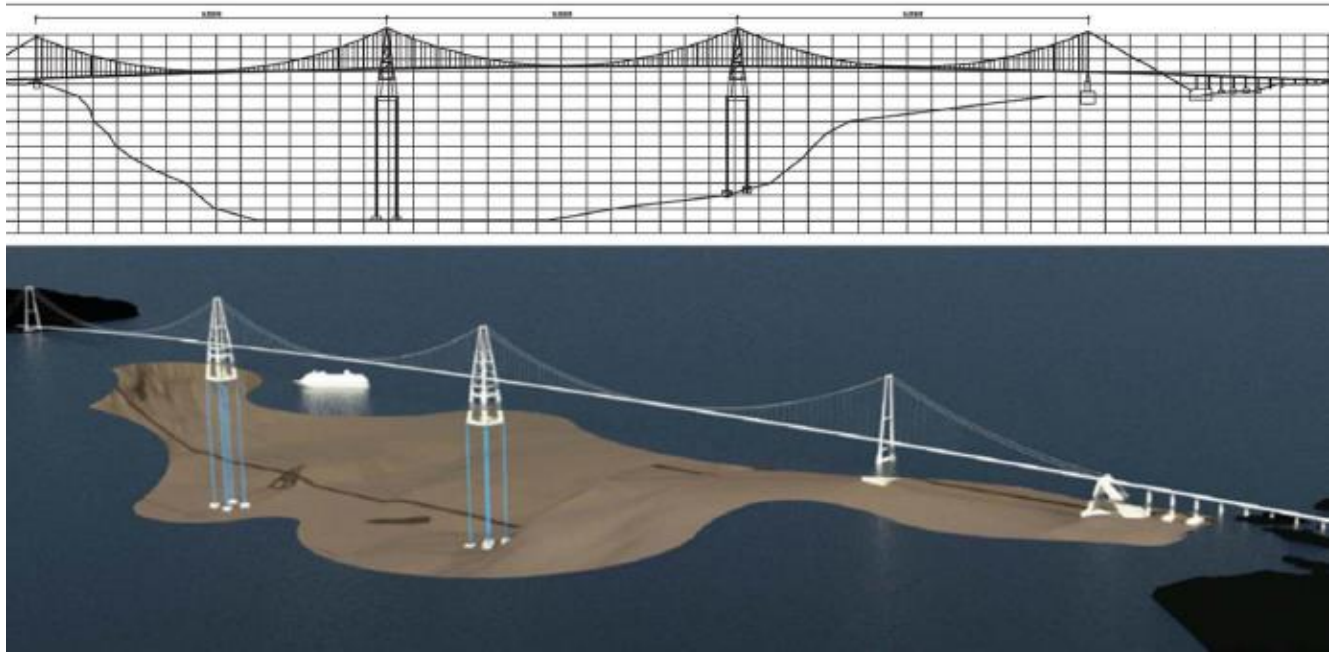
Suspension Bridge Supported by Tension Leg Platform (TLP) Design (Canh Vu).
